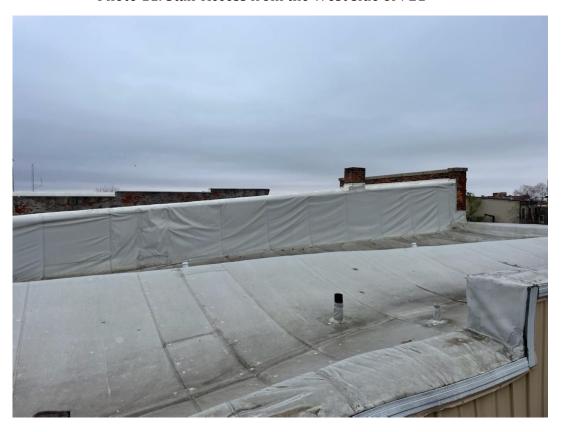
Roof of 721 (parapet wall of 719 in distance)
